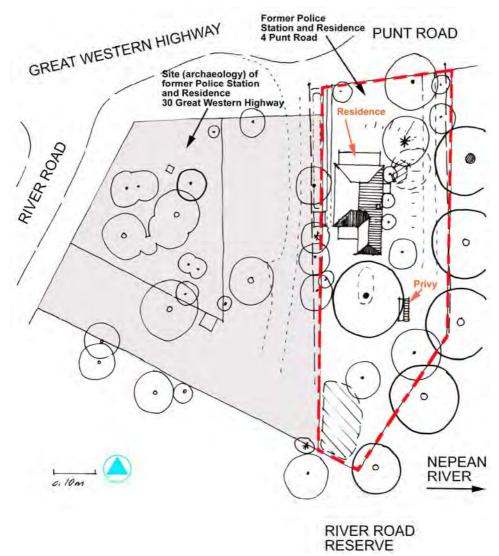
3: Site plan of Former Police Station and Residence, 4 Punt Road, Emu Plains. Base plan prepared by Geoffrey Britton, 2020.
